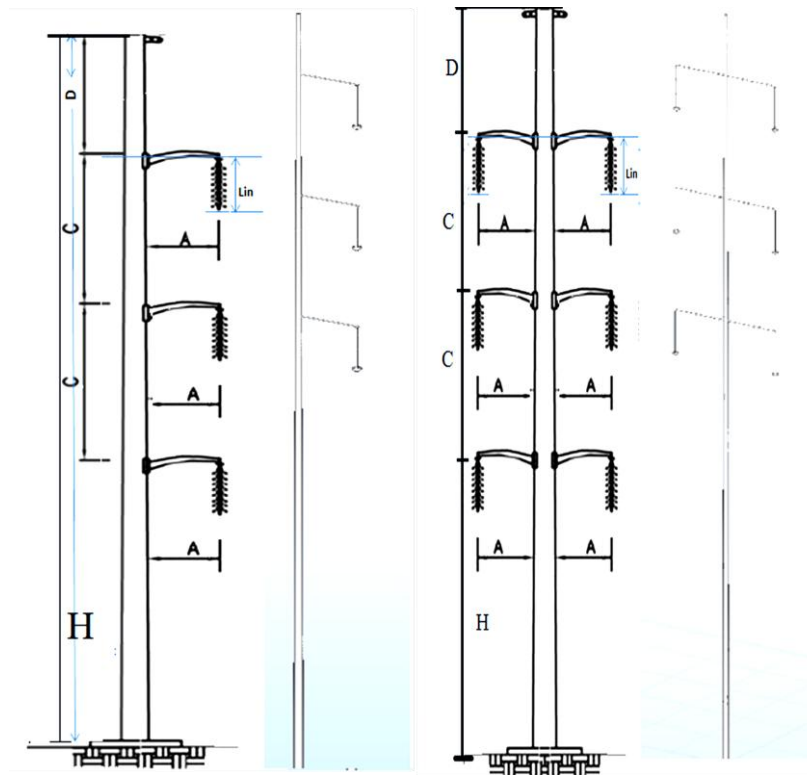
Tapered steel pole tower with string insulator dimensions, modeled in COULOMB®
